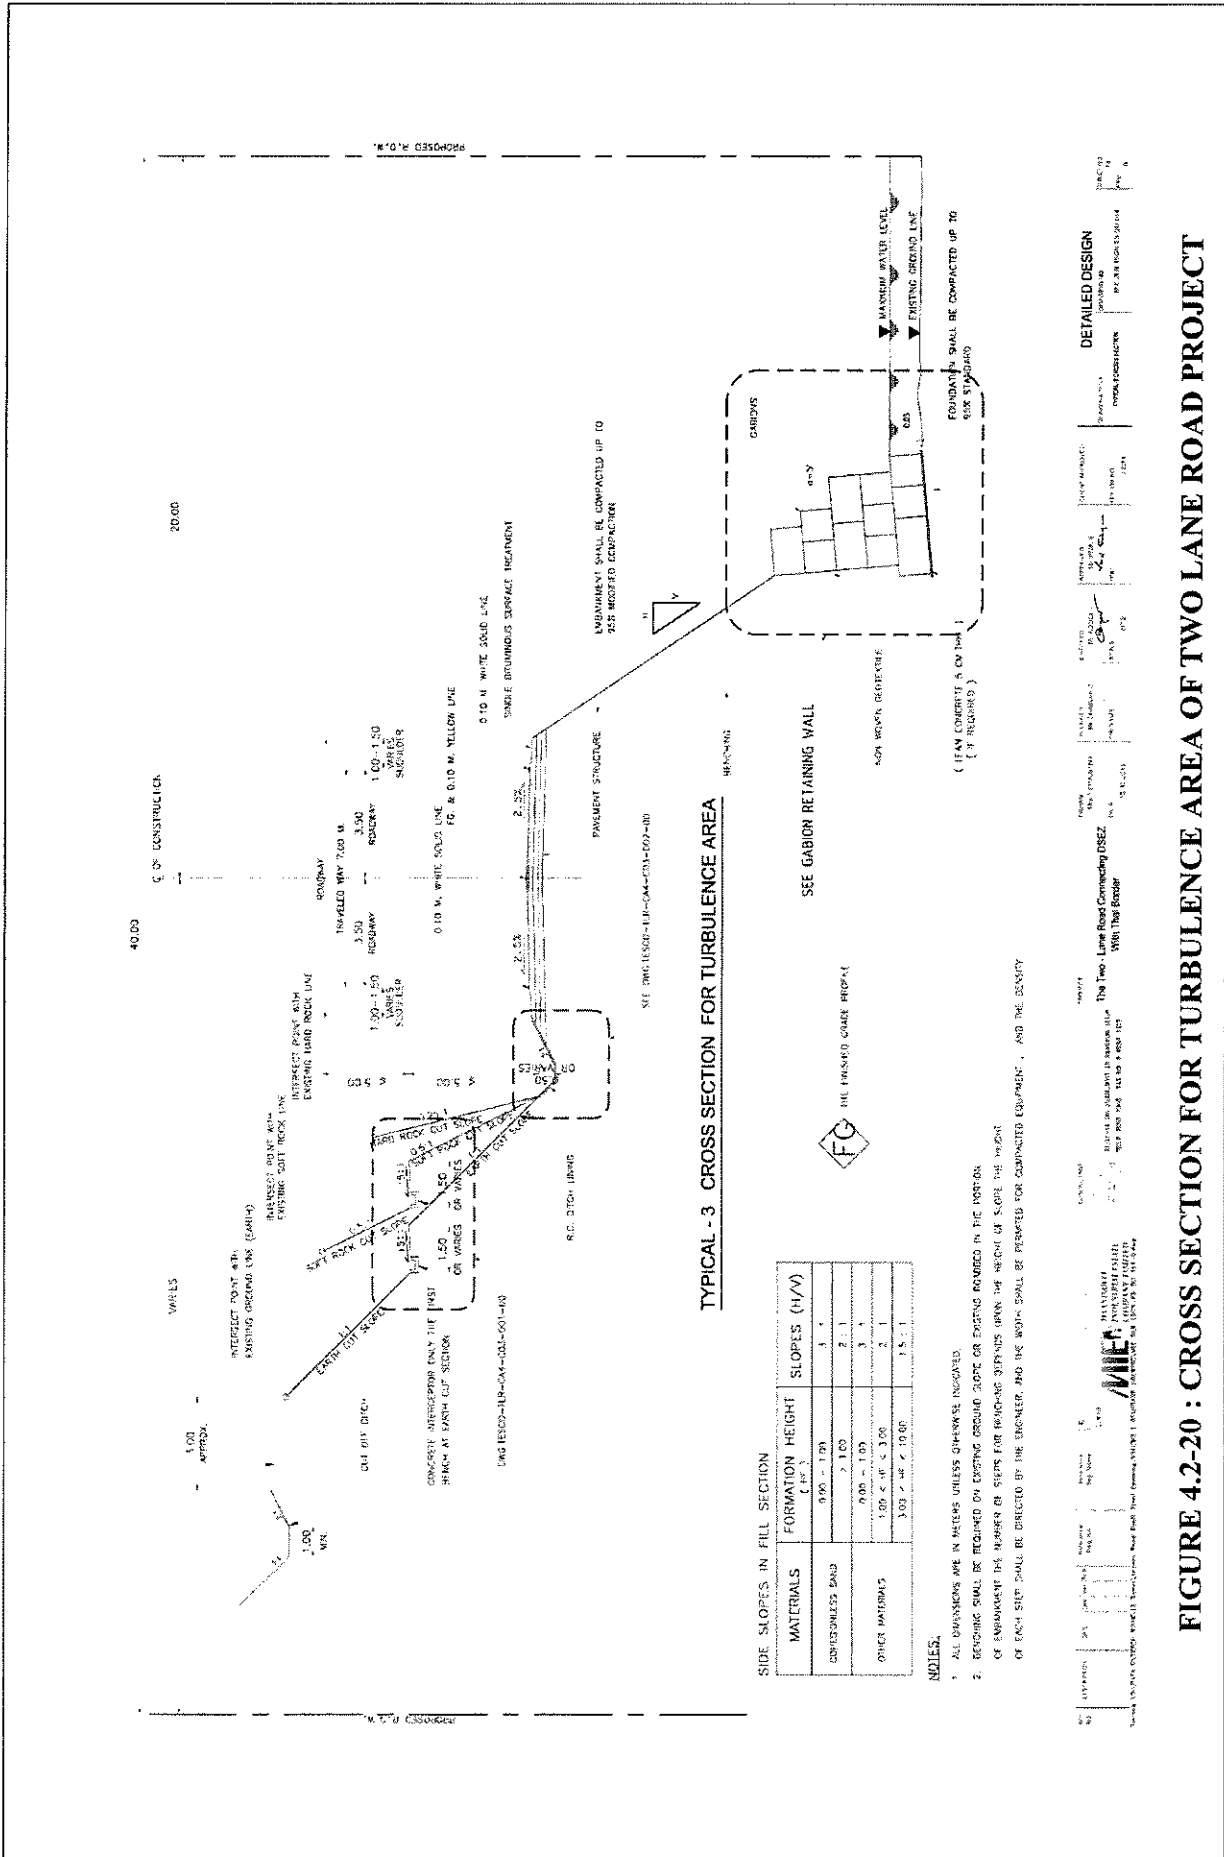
CROSS SECTION FOR TURBULENCE AREA OF TWO LANE ROAD PROJECT
